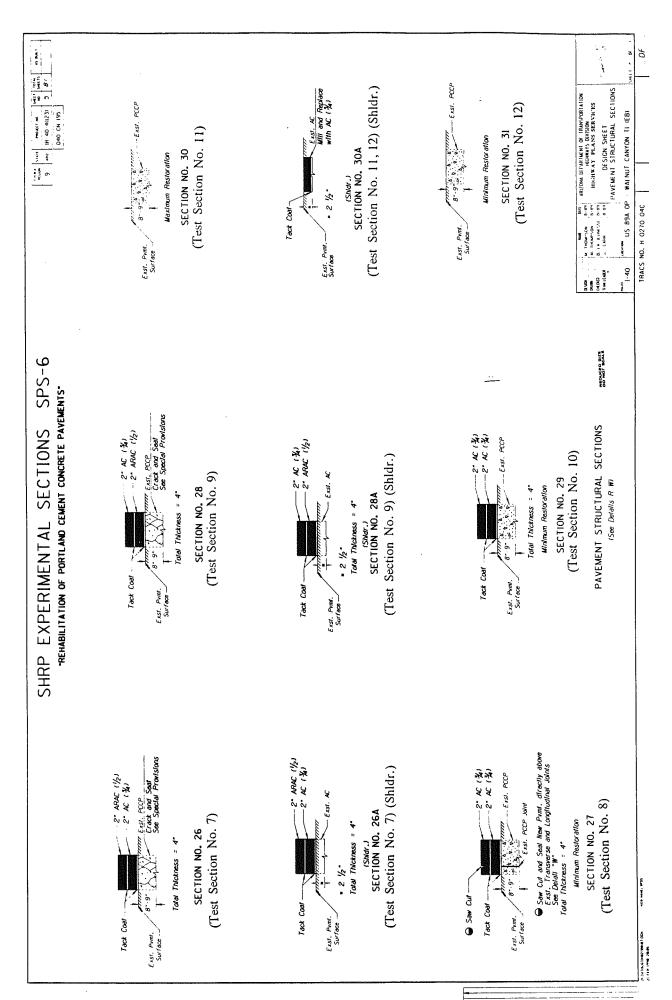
PAVEMENT STRUCTURAL SECTIONS (continued)
